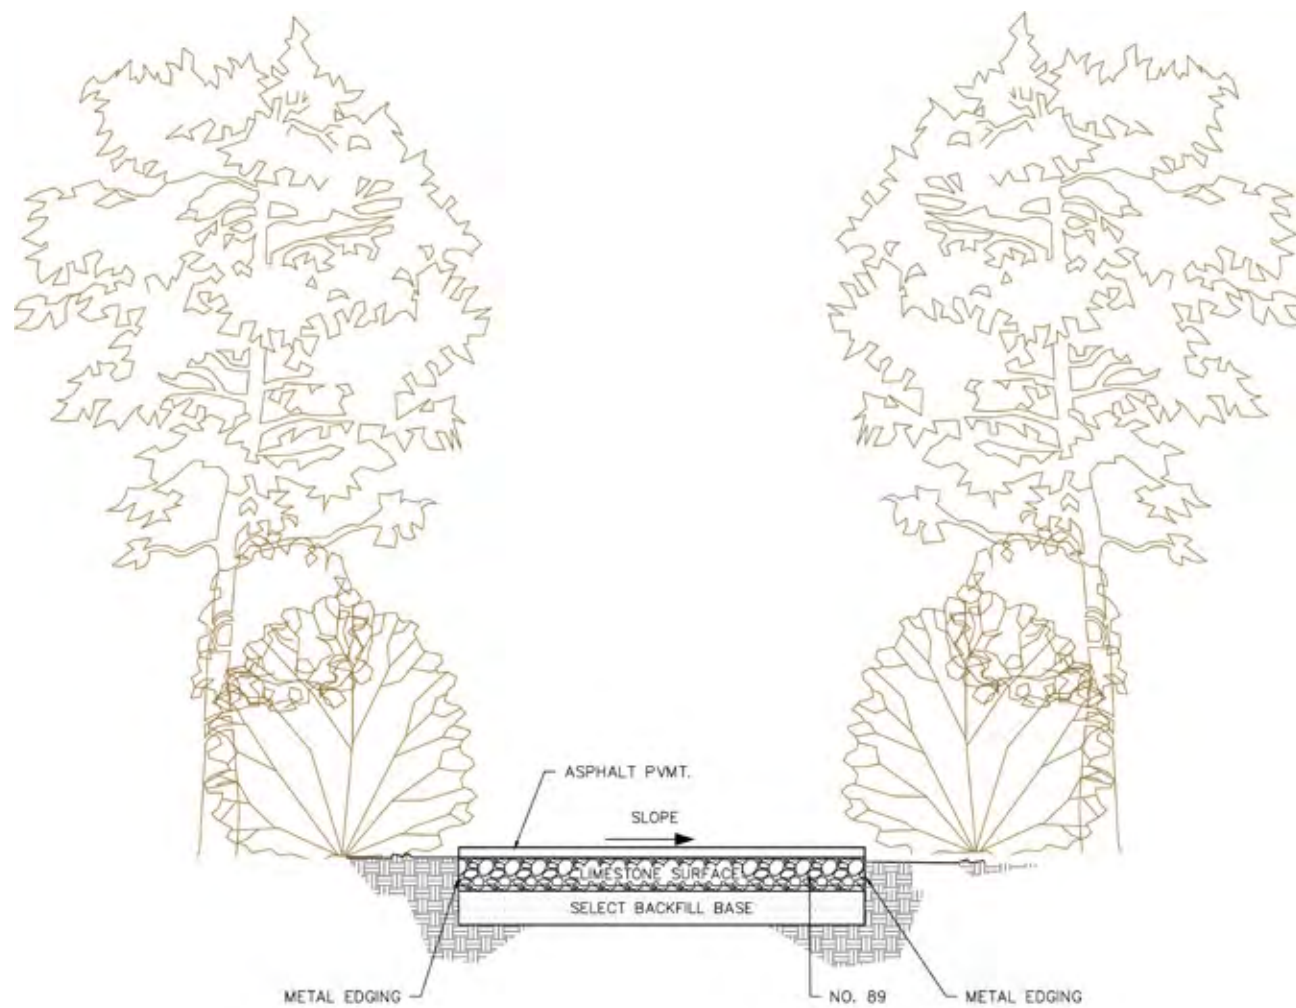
' ORIGINAL HARCO DESIGN (±2009)
